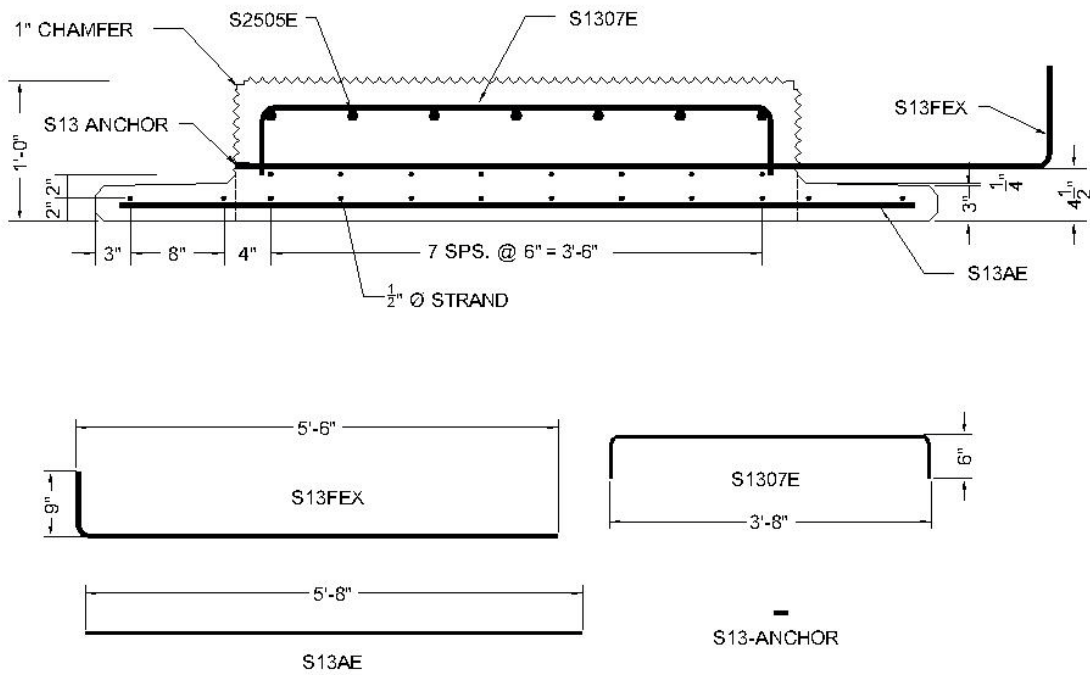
Cross section and individual reinforcement details for the east end of the precast beam 1S in the Concept 2 laboratory bridge specimen
